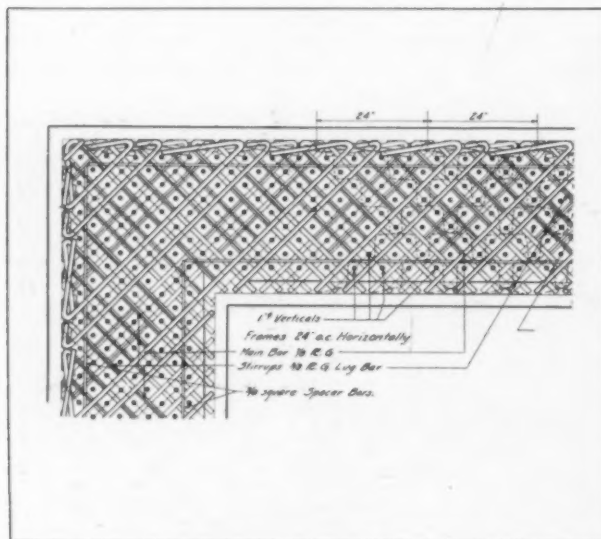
Plan of Horizontal System of Bent Bar Frames with Verticals
